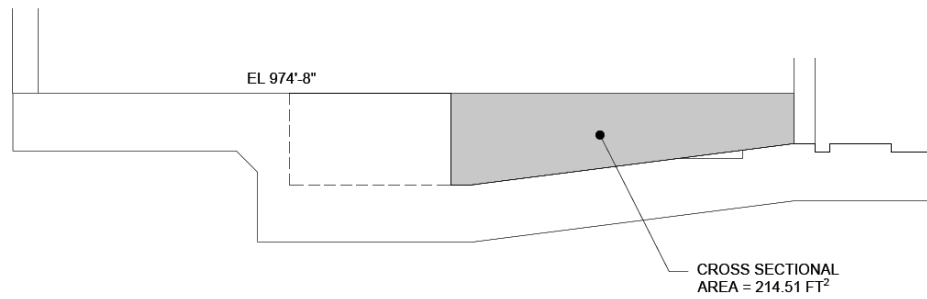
Intake Structure Cut Section Looking North – Void Space
